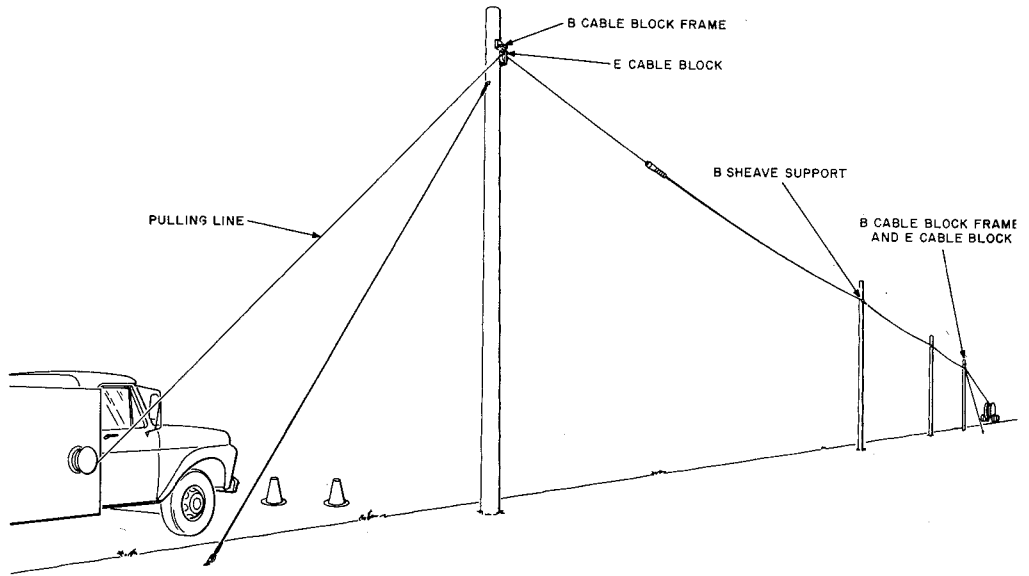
Hardware and Construction Apparatus—In-Line Sections
